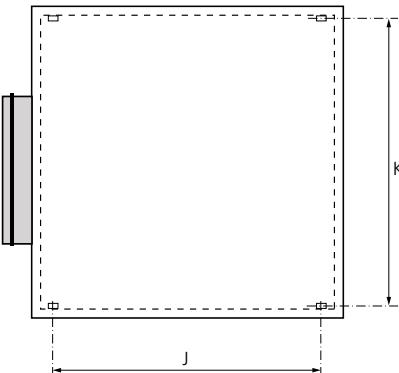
CDH/CLH, suspension (Measurements J x K in table Filter dimensions below).
